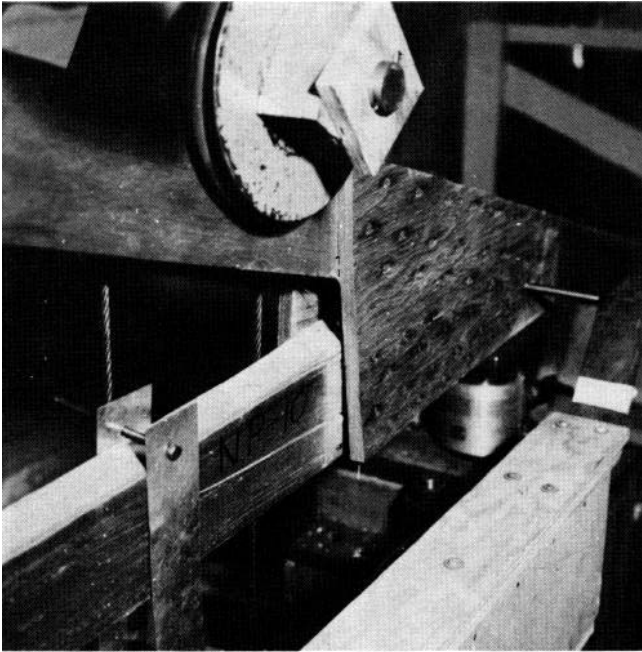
Failure of 10-year-old nailed plywood gusset trussed rafter in heel joint. (M 145840-2)
